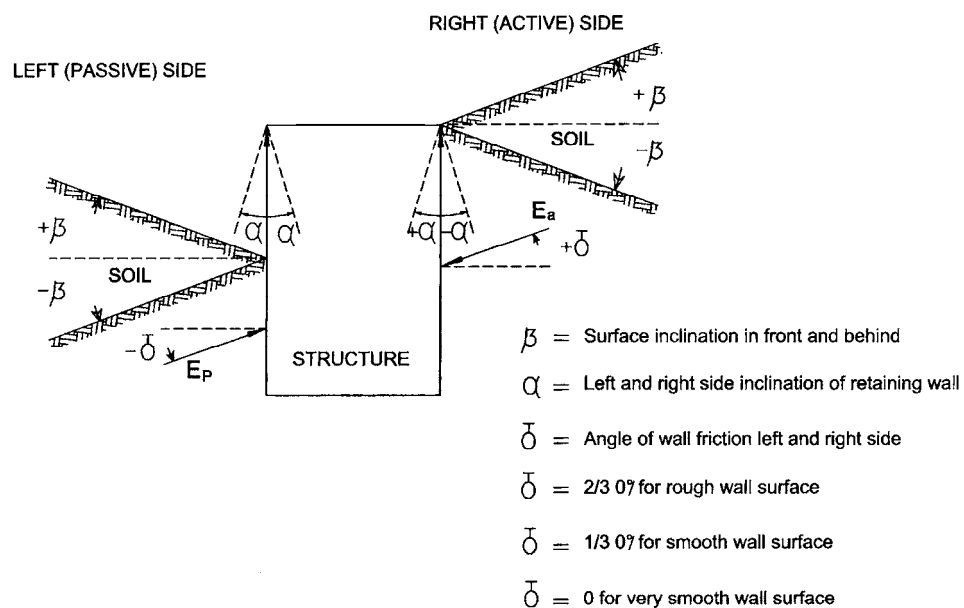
Notation Used in Retaining Wall Stability Analysis.
